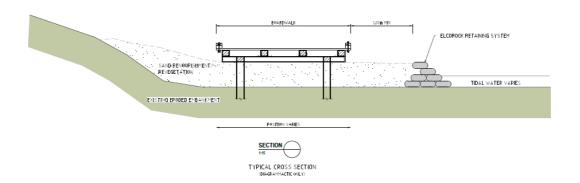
Diagram showing proposed sand nourishment, boardwalk and Elcorock retaining wall (Elevate Consulting Engineers 2024).
